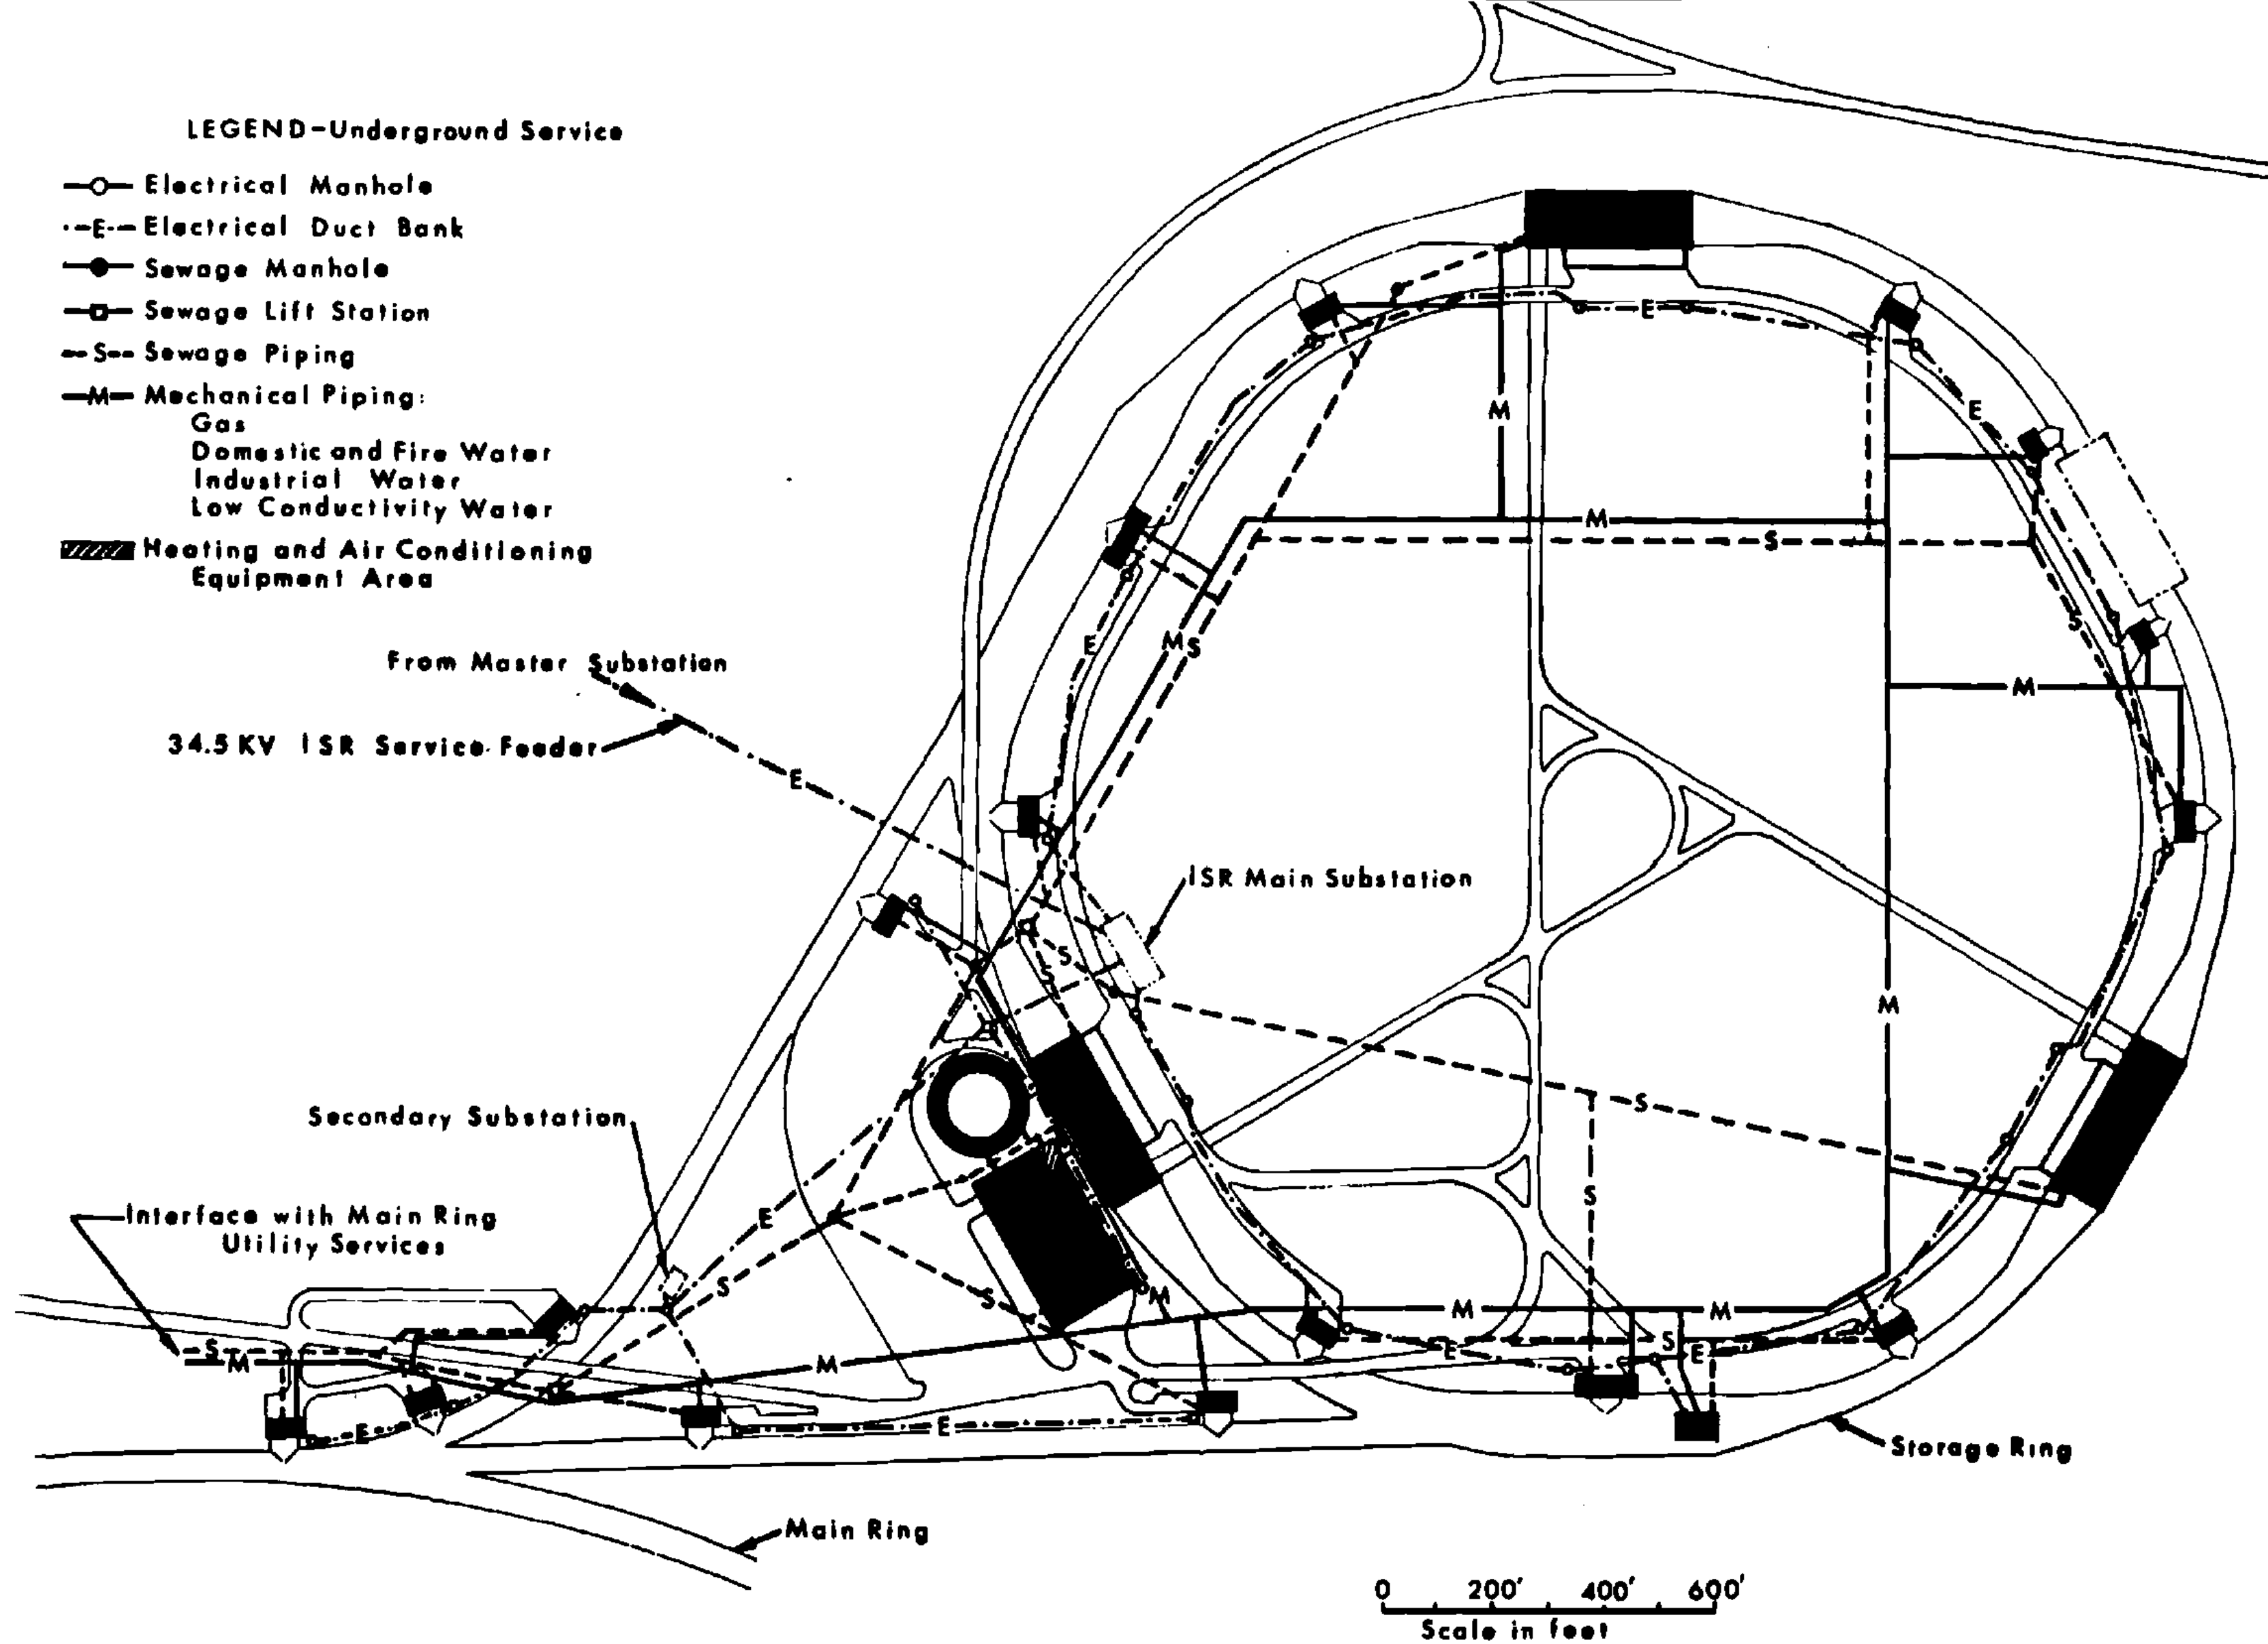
STORAGE RING BUILDINGS and UTILITIES LAYOUT
